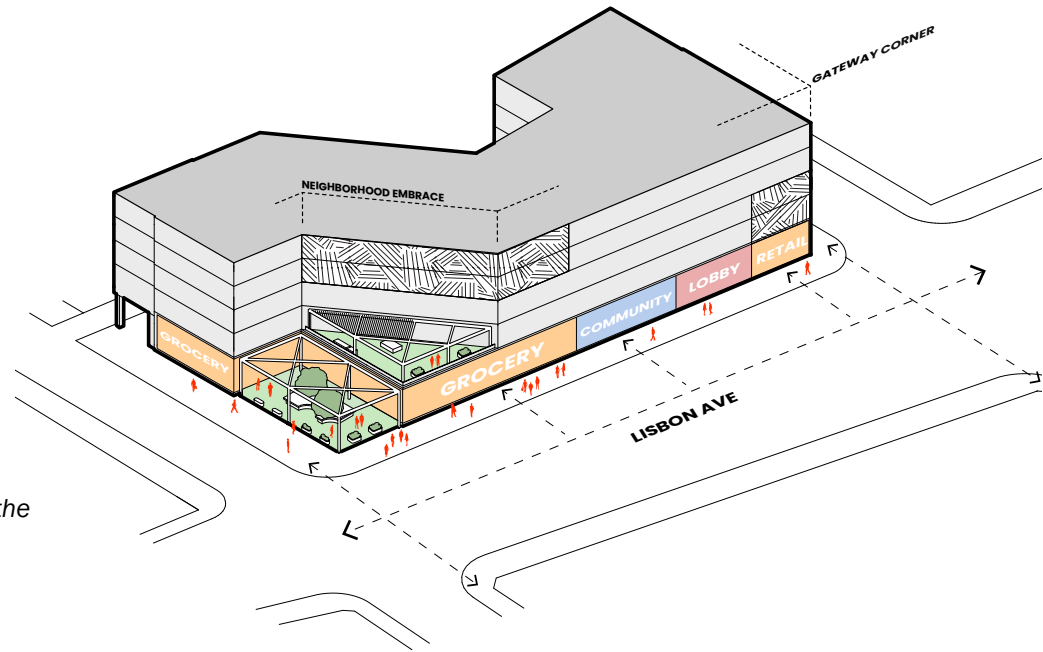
Axonometric drawing showing the massing and arrangement of program and building uses in the proposed building.
